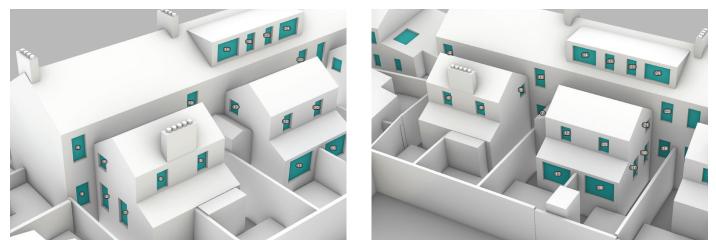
No.53 - 59 Connaught Street (odd numbers): View of model locating VSC & APSH test points.
